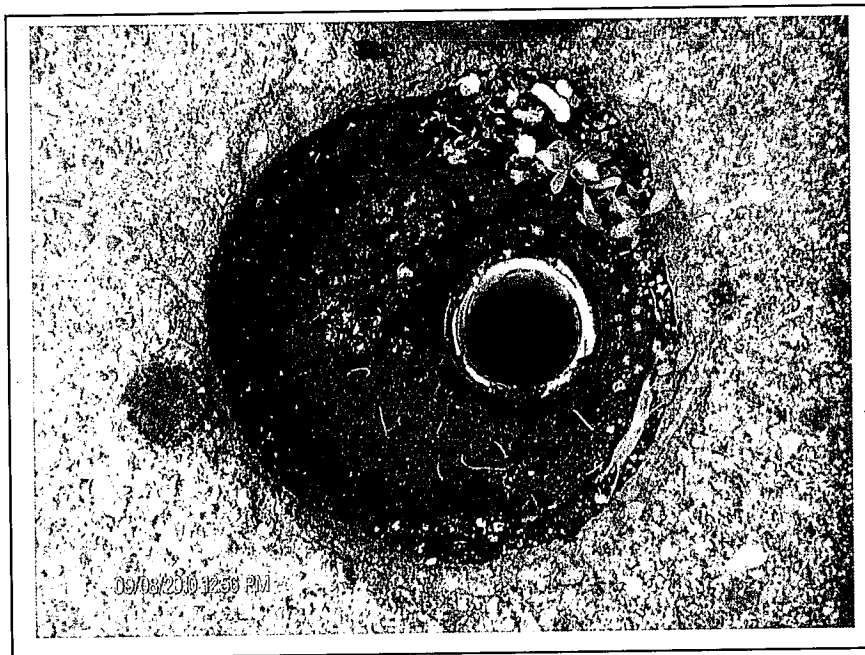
Monitoring Well B2MW was found to be damaged. Note the cracked PVC well casing, debris inside the well casing, and damaged monument. (September 8, 2010)
